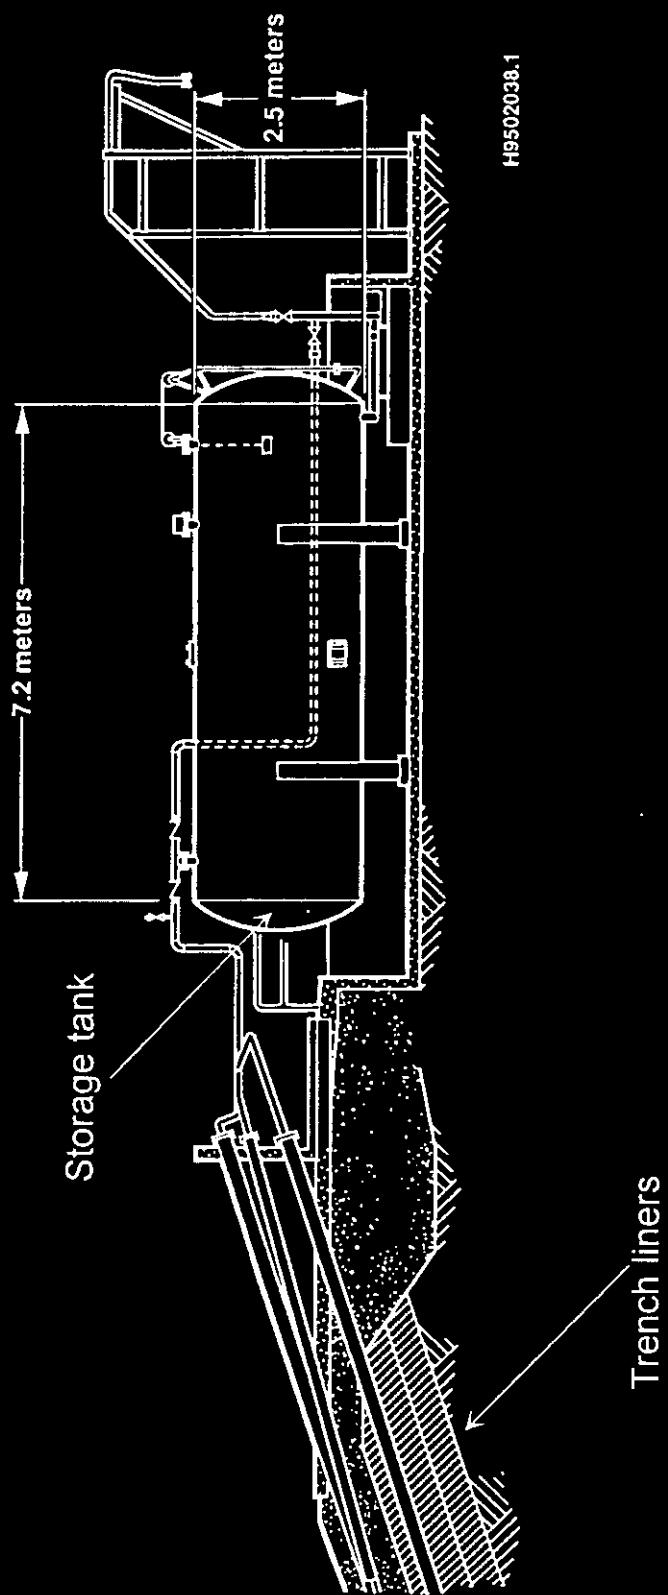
Typical Leachate Storage Tank for Trenches 31 and 34.
